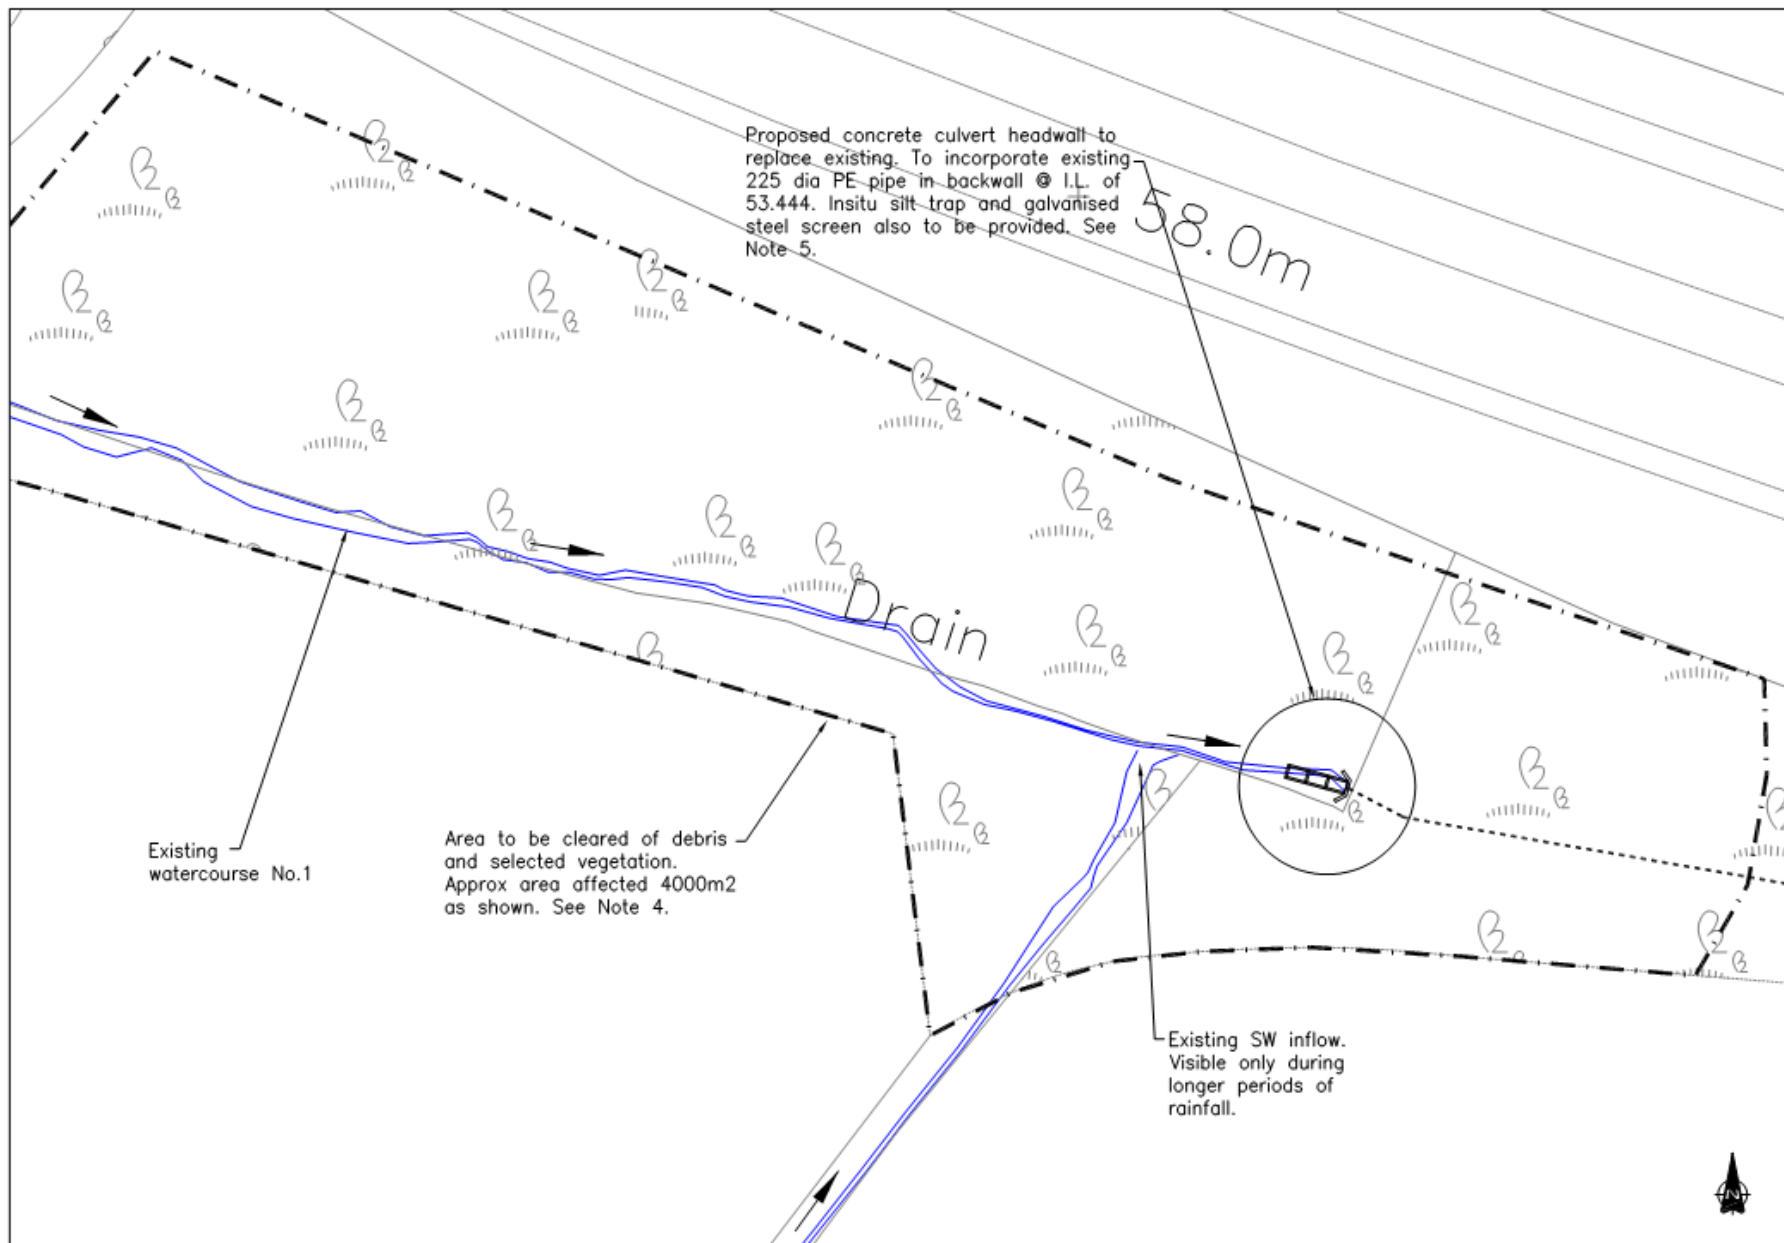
Proposed works at Hawthorn Terrace (1 of 2)
